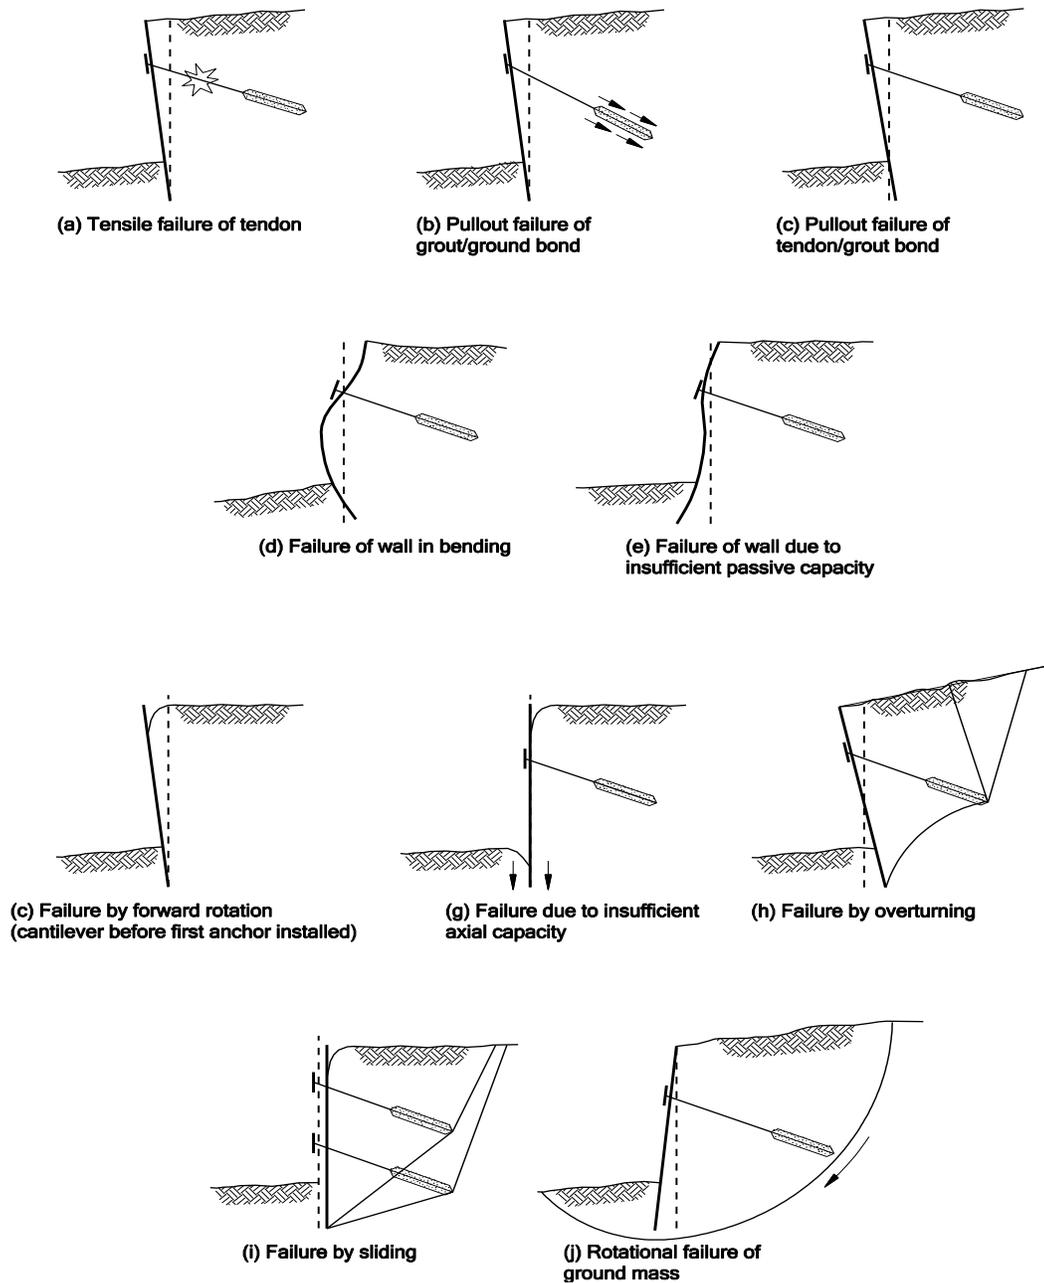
Anchored Walls: External, Internal, Global and Facing Failure Modes
